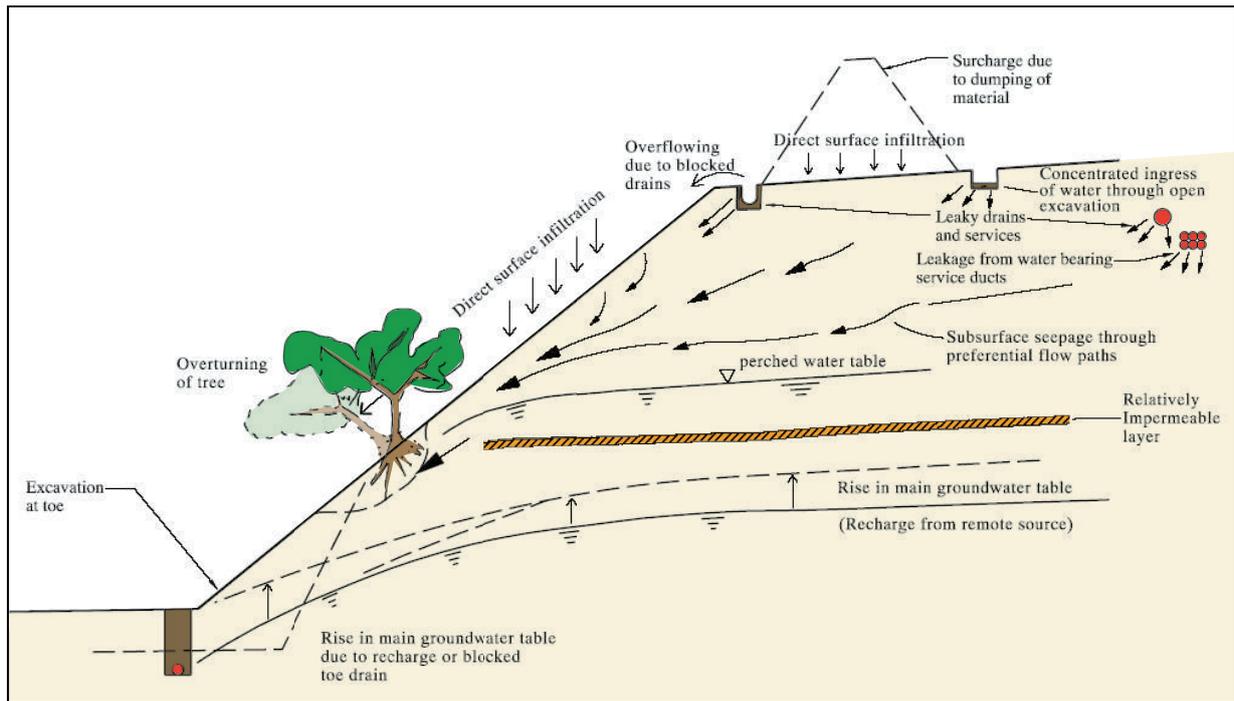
Triggers and contributory factors for fill slope failure (Sun, 1998)
